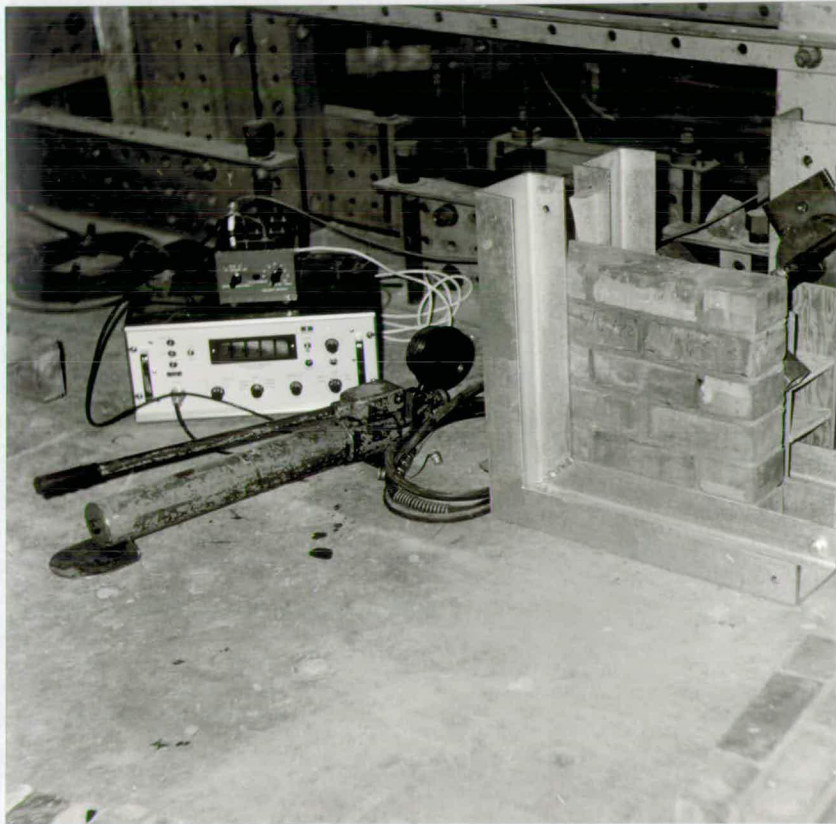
GENERAL VIEW OF TESTING EQUIPMENT
